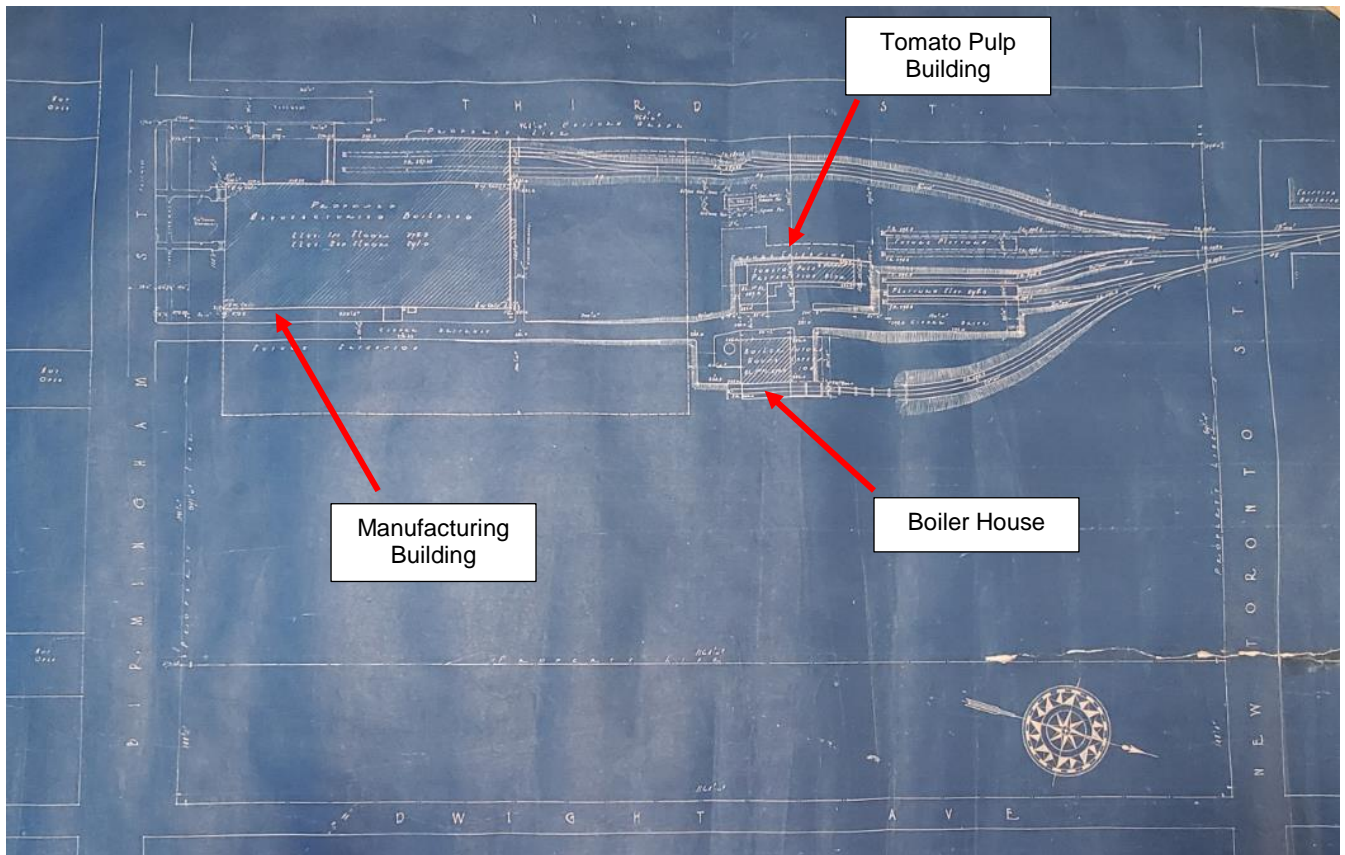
Site plan annotated to show the location of the manufacturing building, boiler house, and tomato pulp building, Mathers & Haldenby, 3 March 1931 (Courtesy of the Archives of Ontario)
